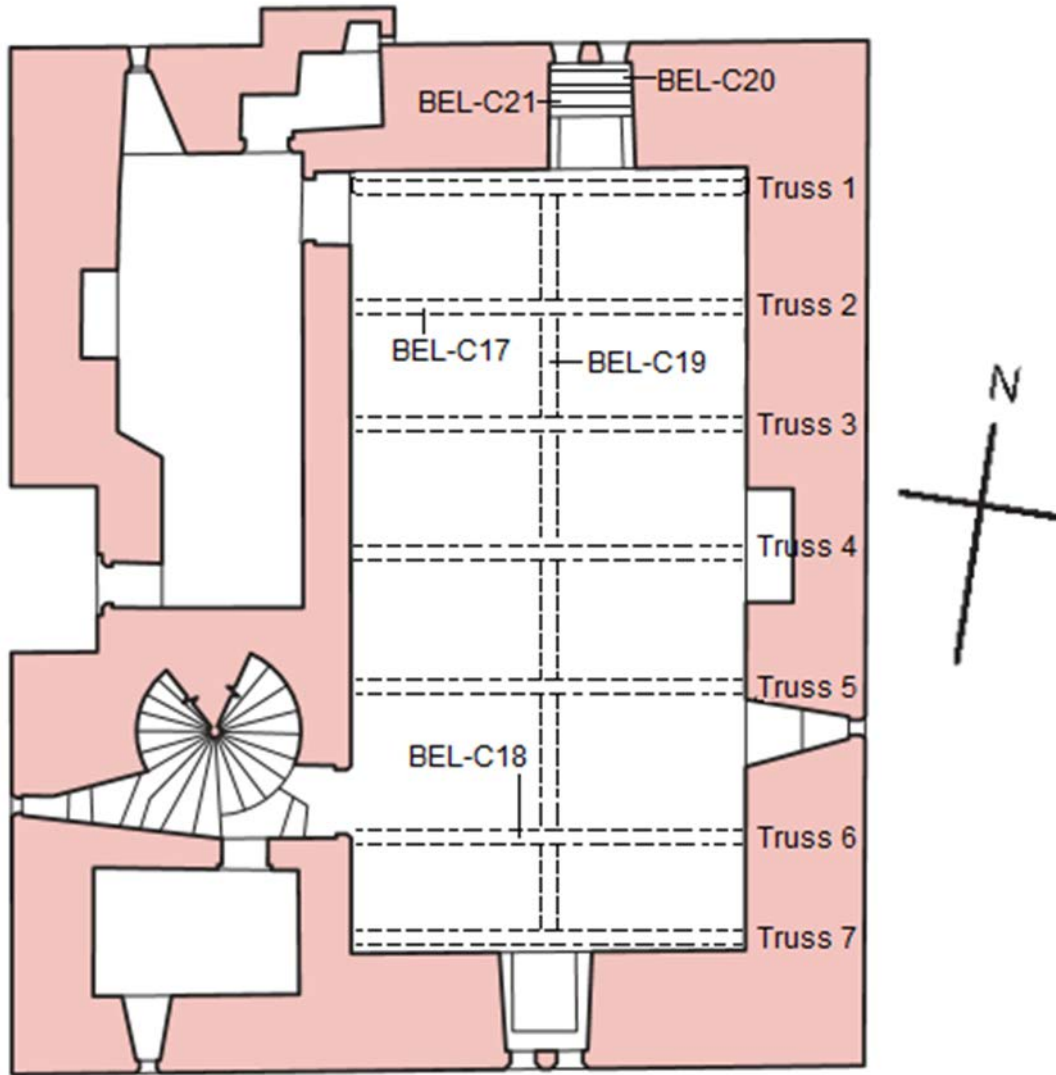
Plan of Castle tower, showing the location of samples BEL-C17–21
